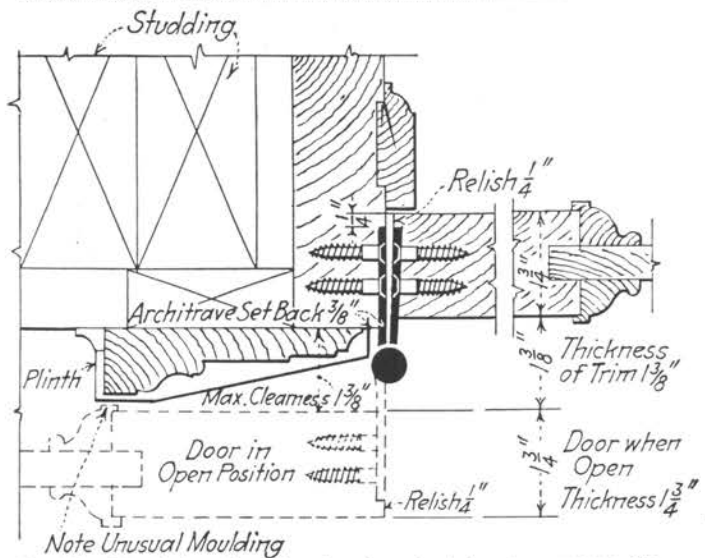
Detail drawing showing how to determine proper size butt for a door
